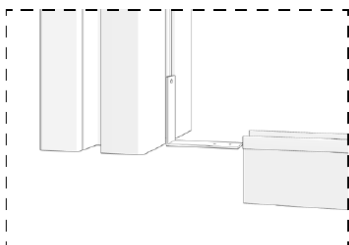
LOWER RAIL LOCATED AGAINST THE POST
